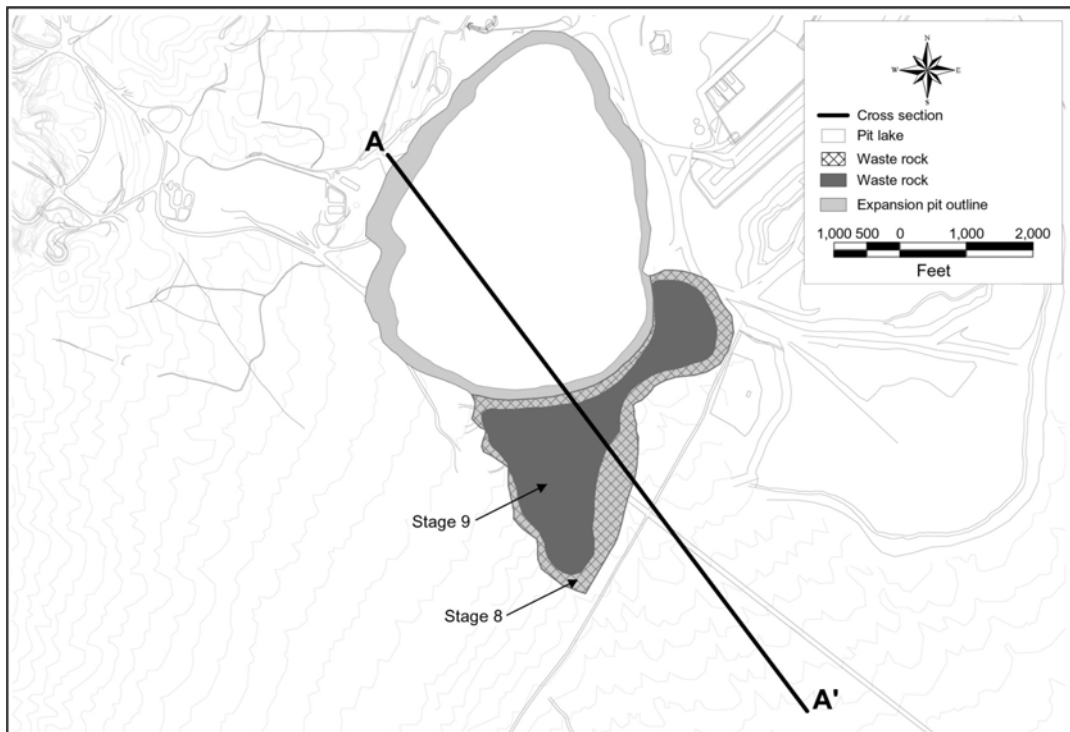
Stage 9 Plan View Pipeline/South Pipeline Open Pit
